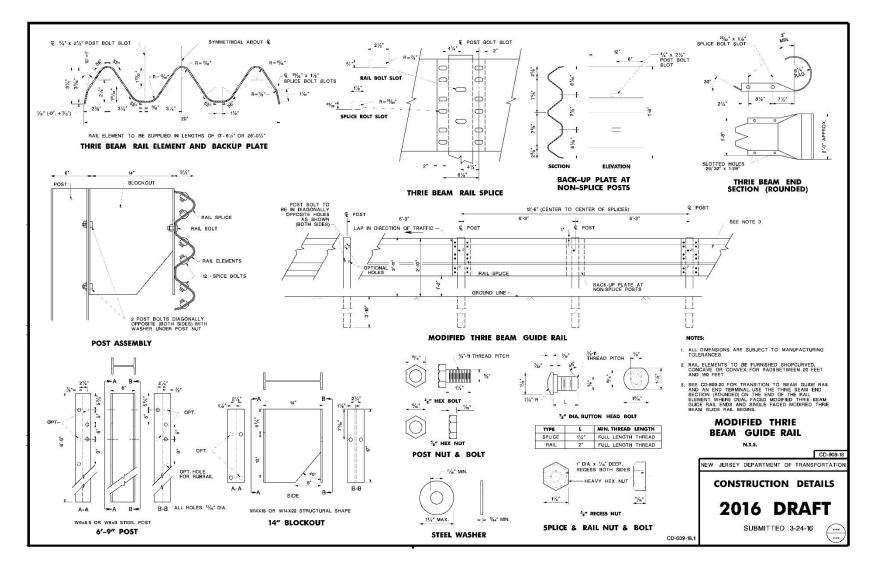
NJDOT Modified Thrie Beam Details, Test No. MTB-1
